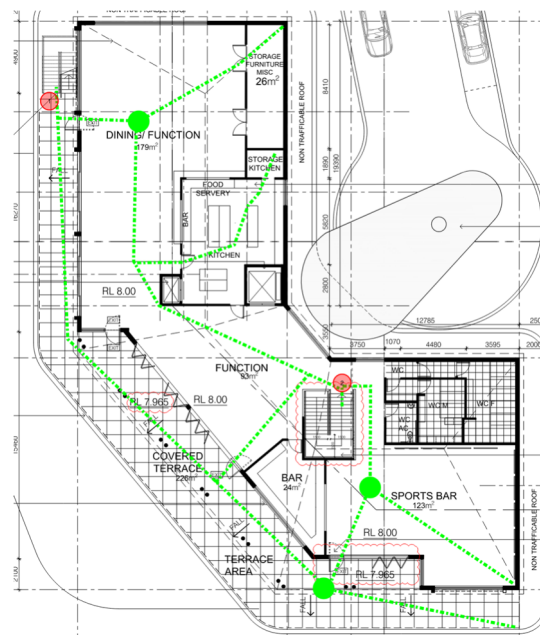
FIRST FLOOR LEVEL EGRESS
